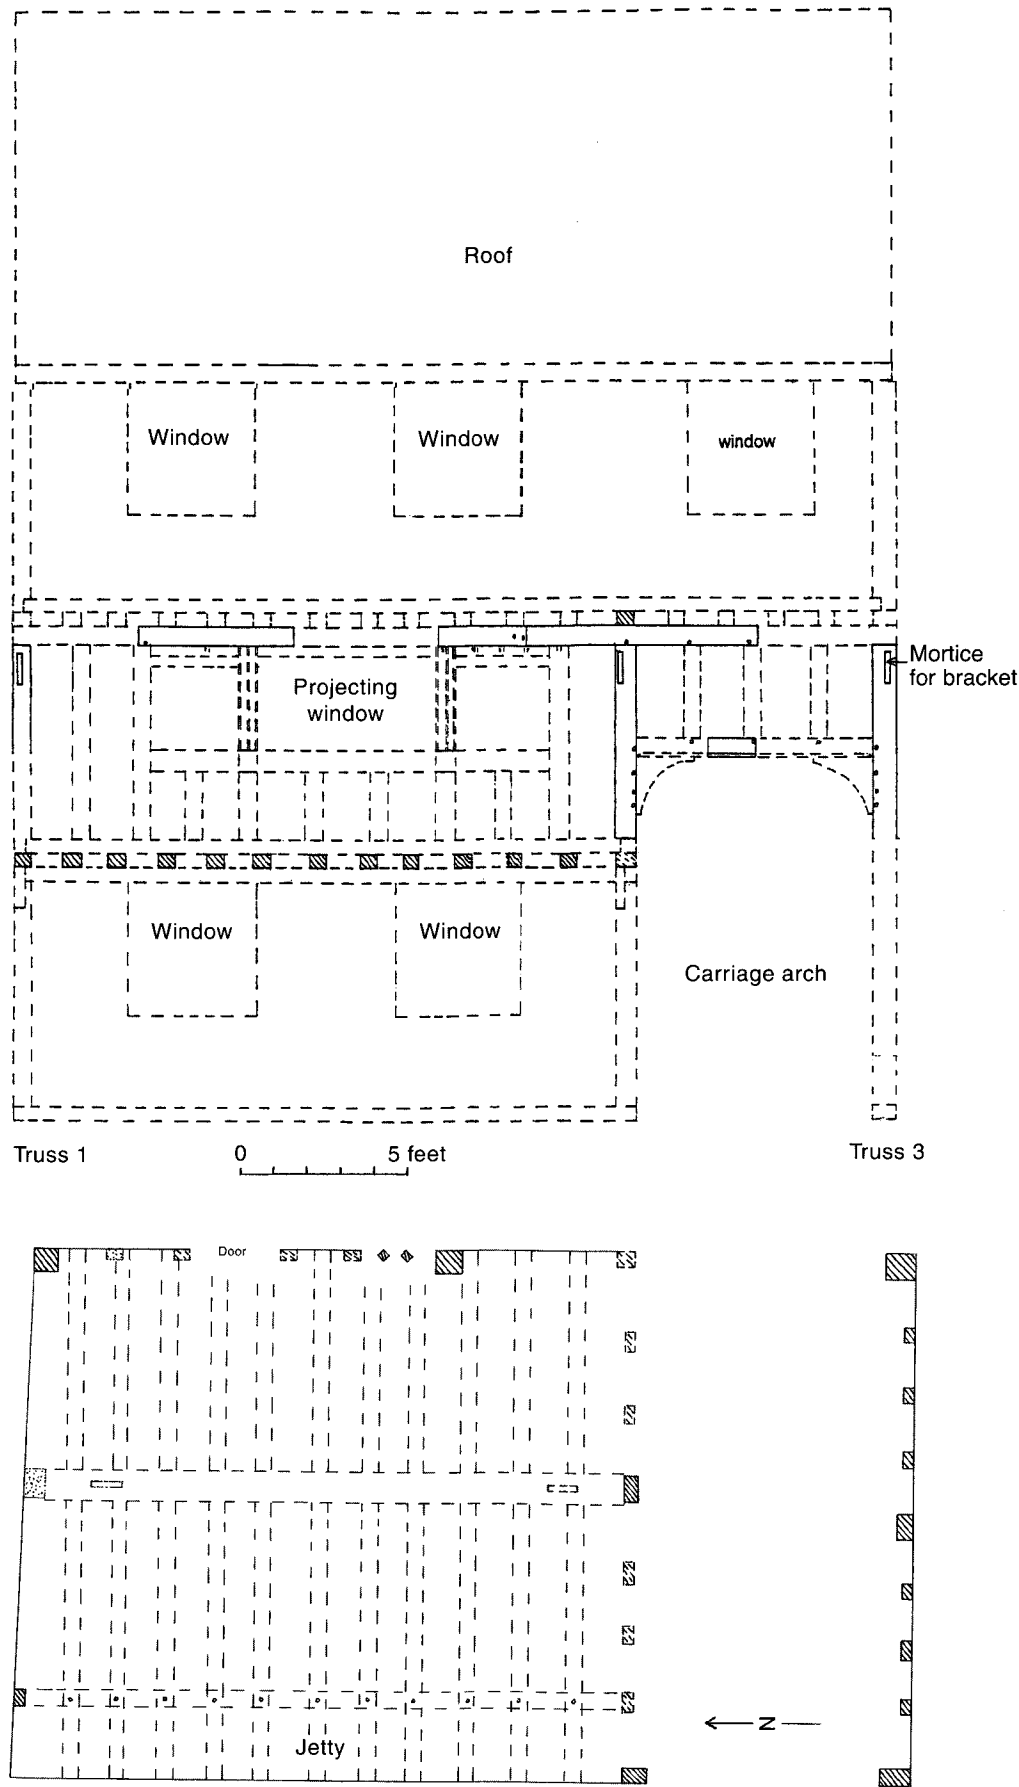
Front elevation and ground plan of no. 3 Queen Street, Colchester. All the joists survived, except the two at the northern end. Note that the joists were pegged to the lower jetty beam. The post on the north side of the carriage arch is shown extending right down to the ground, but there may have been a jetty at this point.
